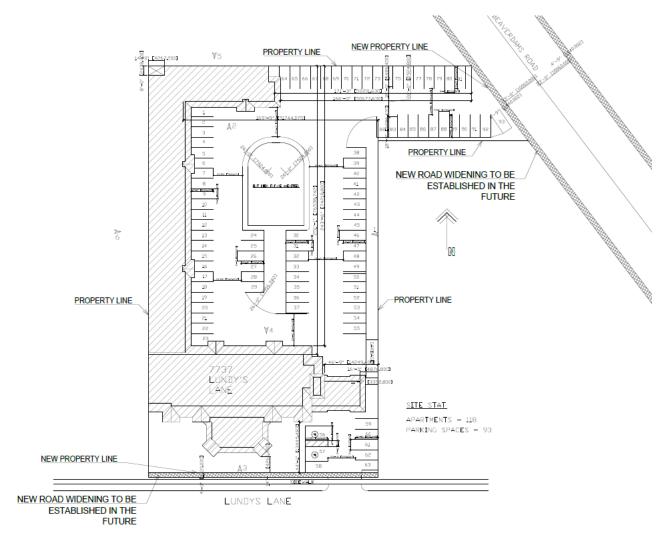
Site Plan for 7737 Lundy's Lane. Prepared by Benan Hanoudi Architect Inc.
